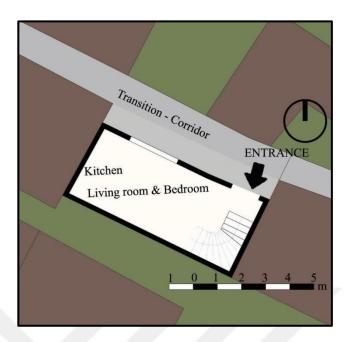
The draft of the first housing, ground floor (Prepared by Author)
